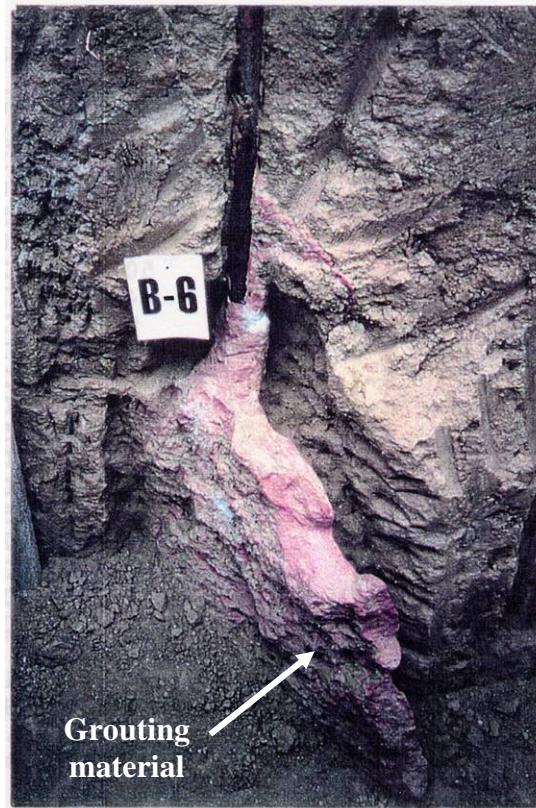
A hydraulic fracture caused by grouting [Warner, 1997].
